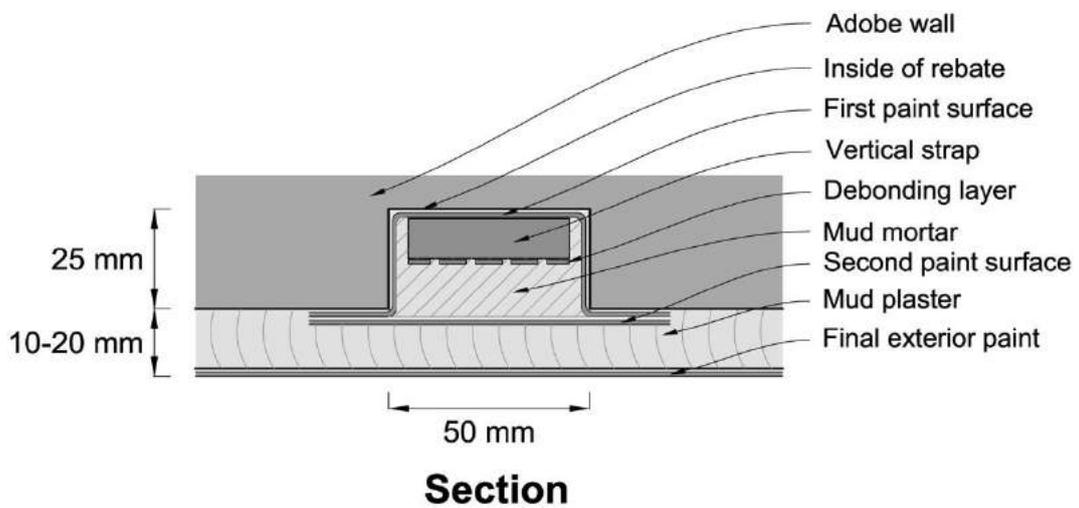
Section through a vertical strap showing the two internal painted surfaces to protect the strap from moisture.
